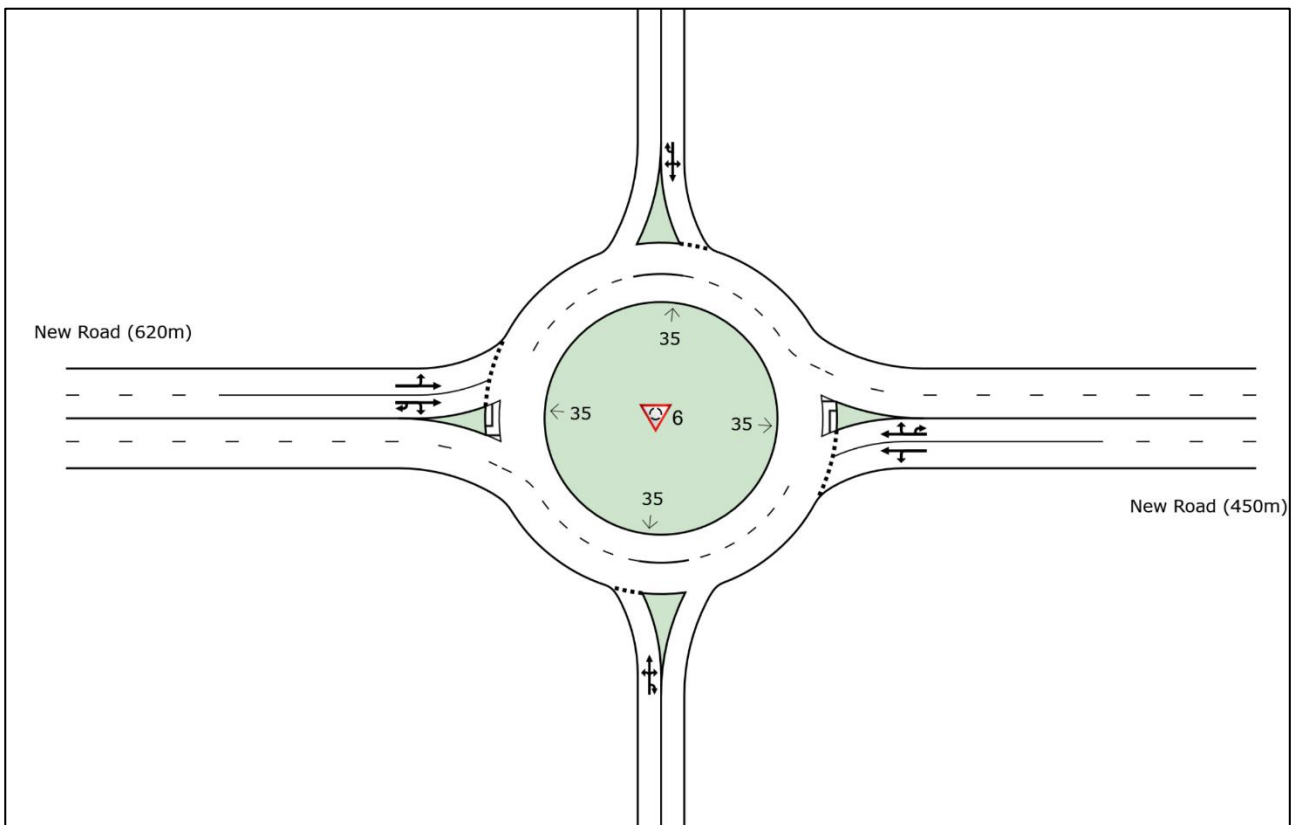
Interim 2026 SIDRA Intersection Layout – Aldington Road / Site Access
